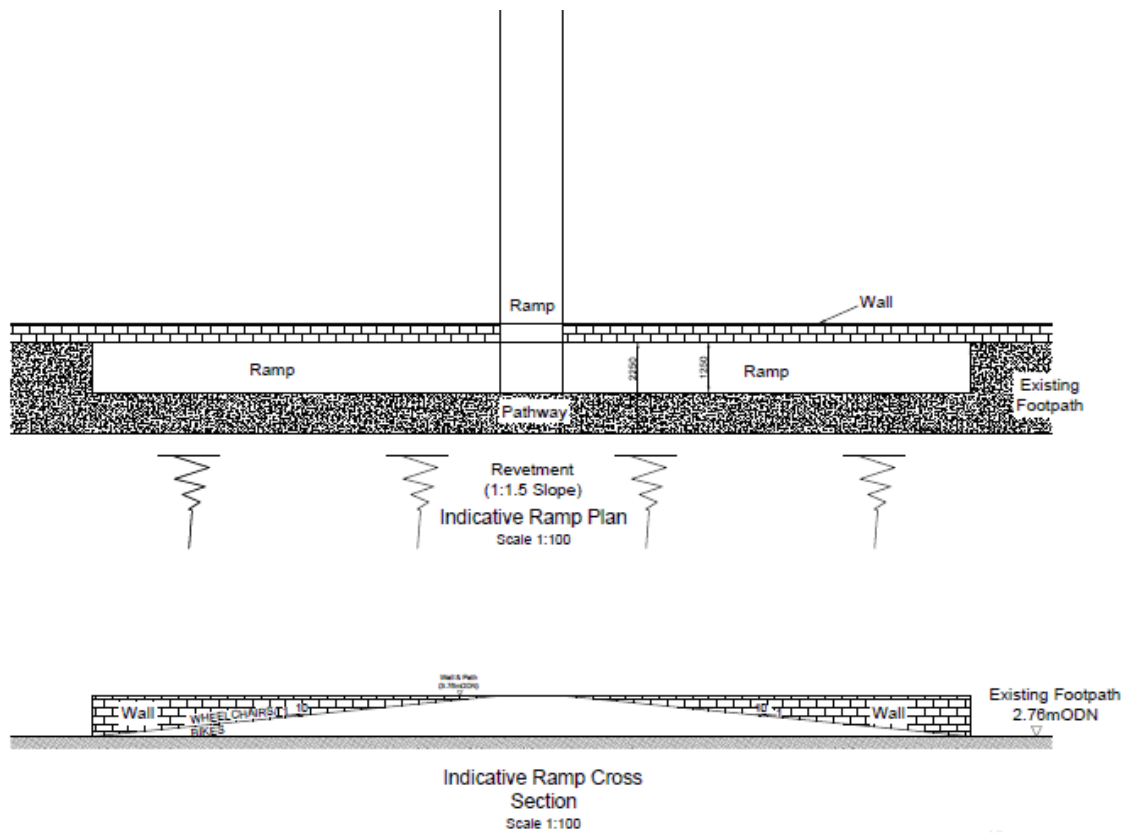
Example of ramping over a floodwall - an indicative ramp plan and cross section
